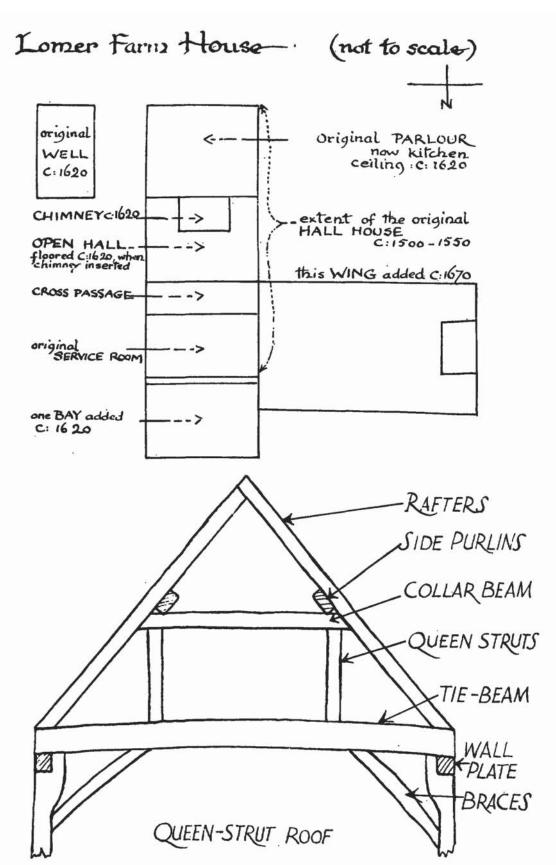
Plan and sketch of roof truss, Lomer Farm House.
